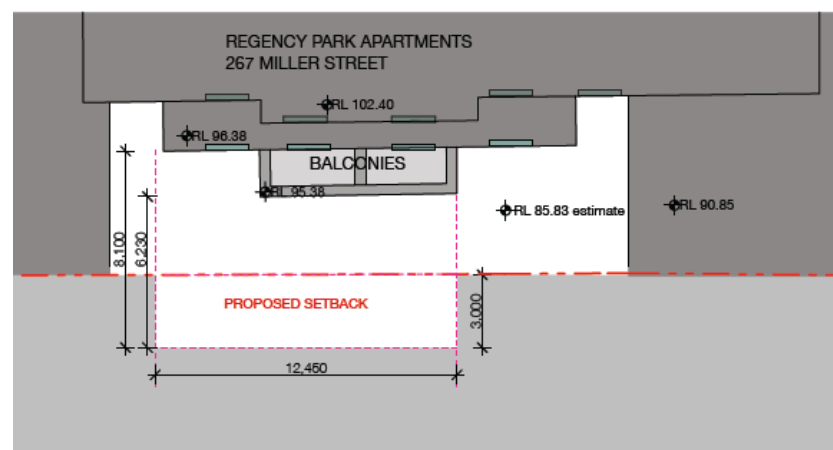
Existing and proposed setbacks to the adjoining residential building
